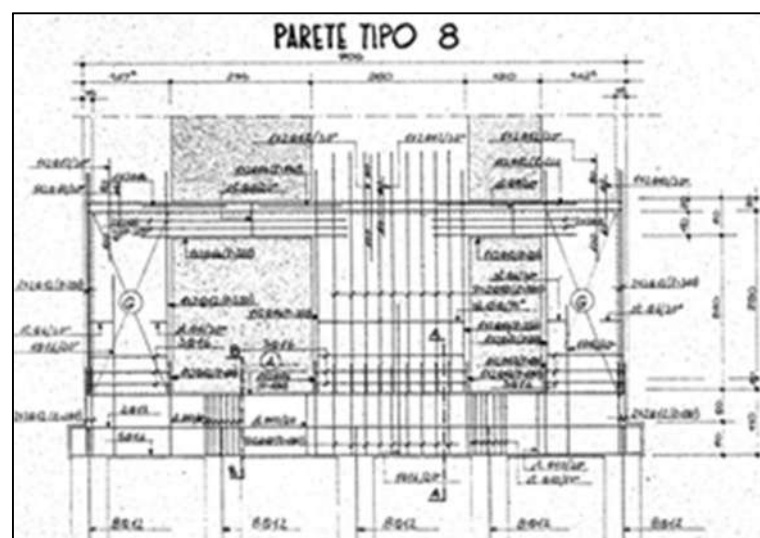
Executive detail of a wall panel at the foundation-(S9_STRUCTURAL)
